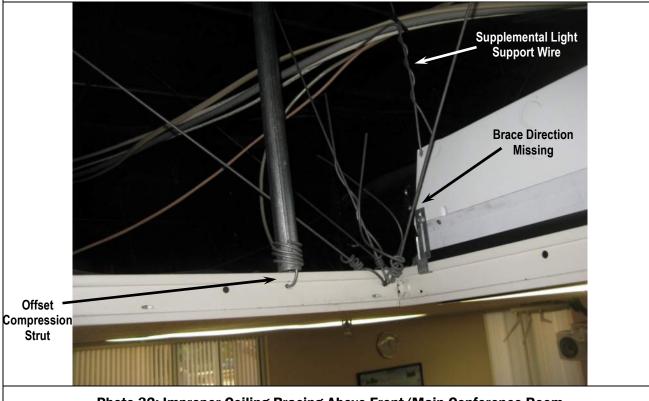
Improper Ceiling Bracing Above Front/Main Conference Room
